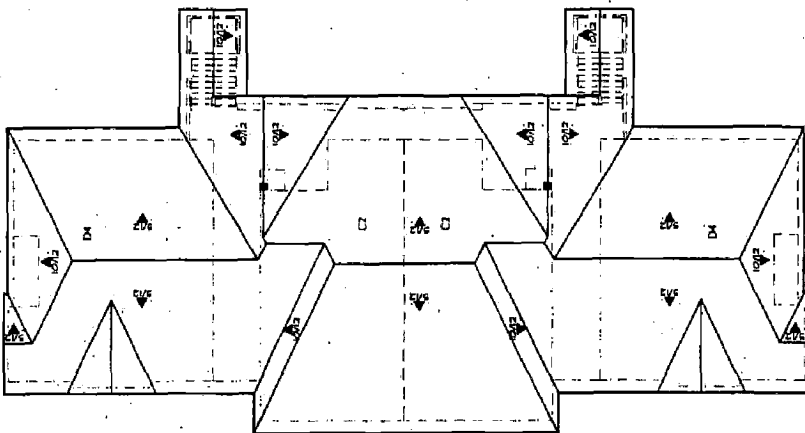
W - Building Type Xa - Third Floor and Roof Plans
